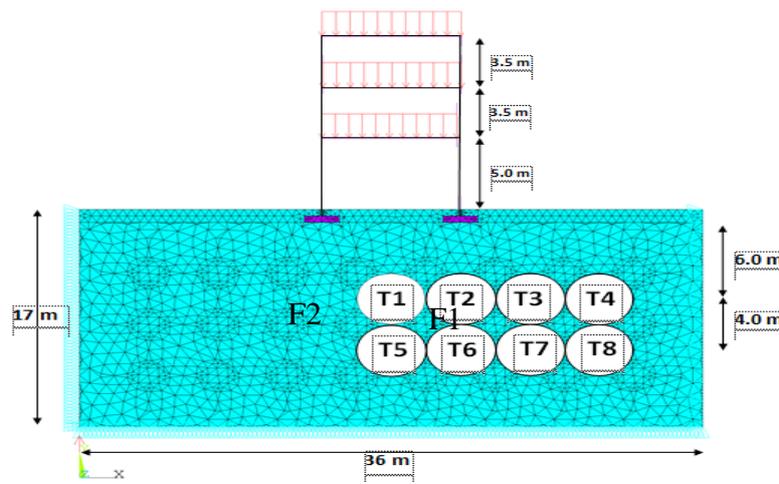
Element formation and study case with tunnel excavated at proposed eight locations below the super-structure
